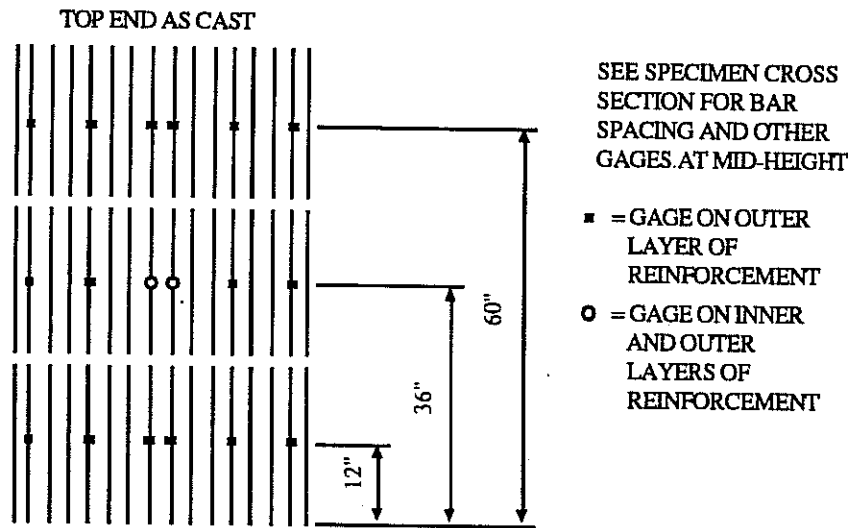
Gage Positions on Compression Face, Specimen 5S9
